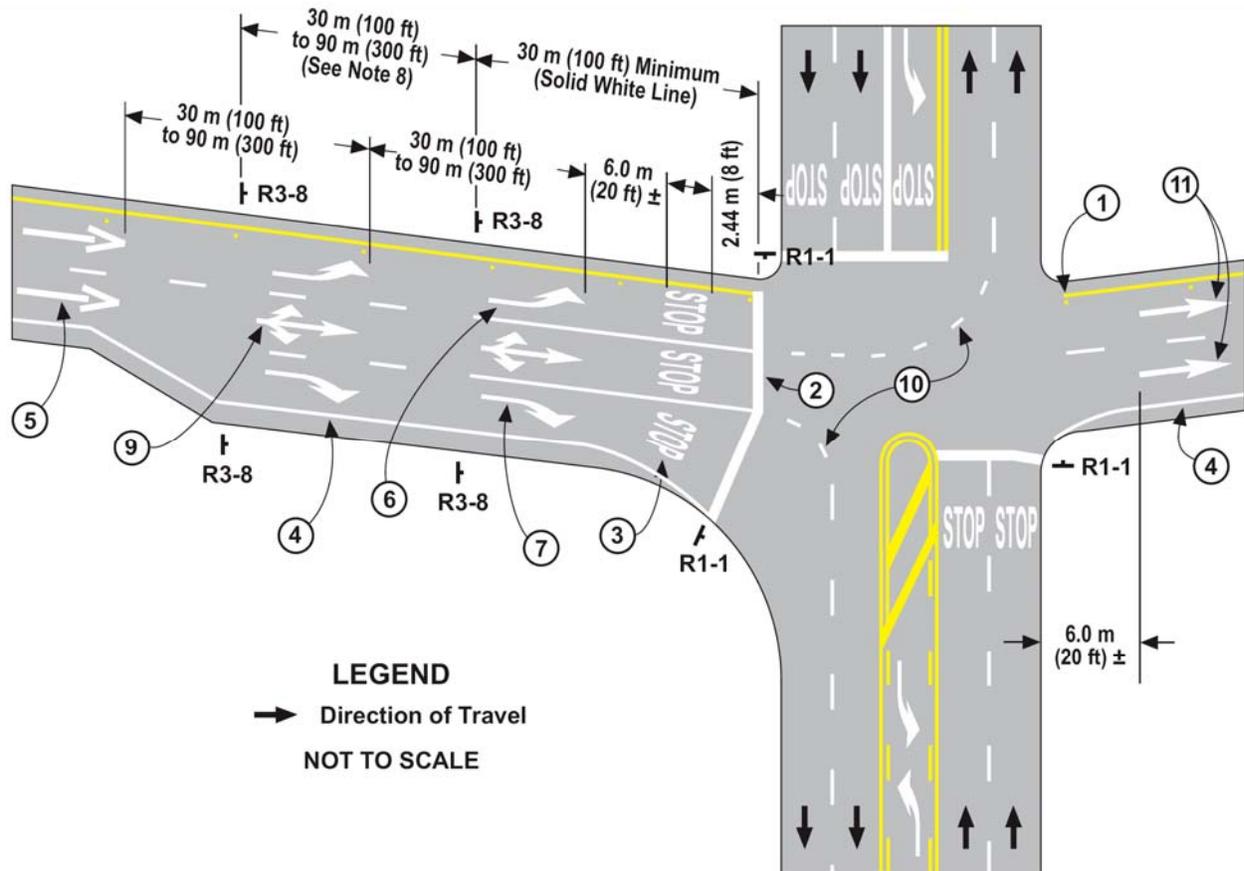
B-23 (CA). Examples of Entrance/Exit Ramp Terminal Signs and Pavement Markings (Sheet 5 of 6)
